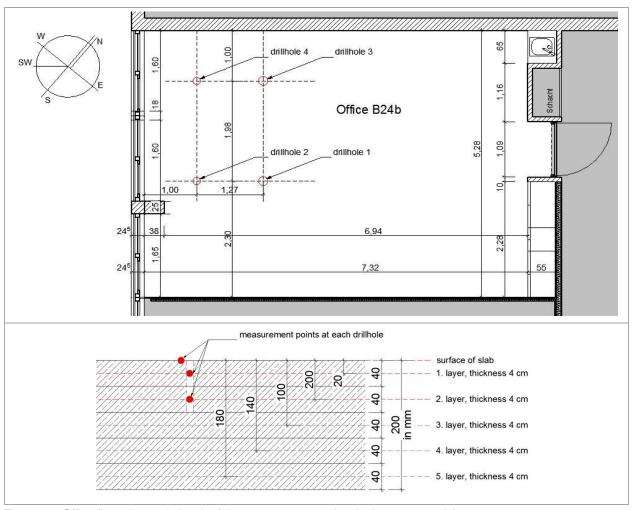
Office floor plan and sketch of the measurement points in the concrete slab
